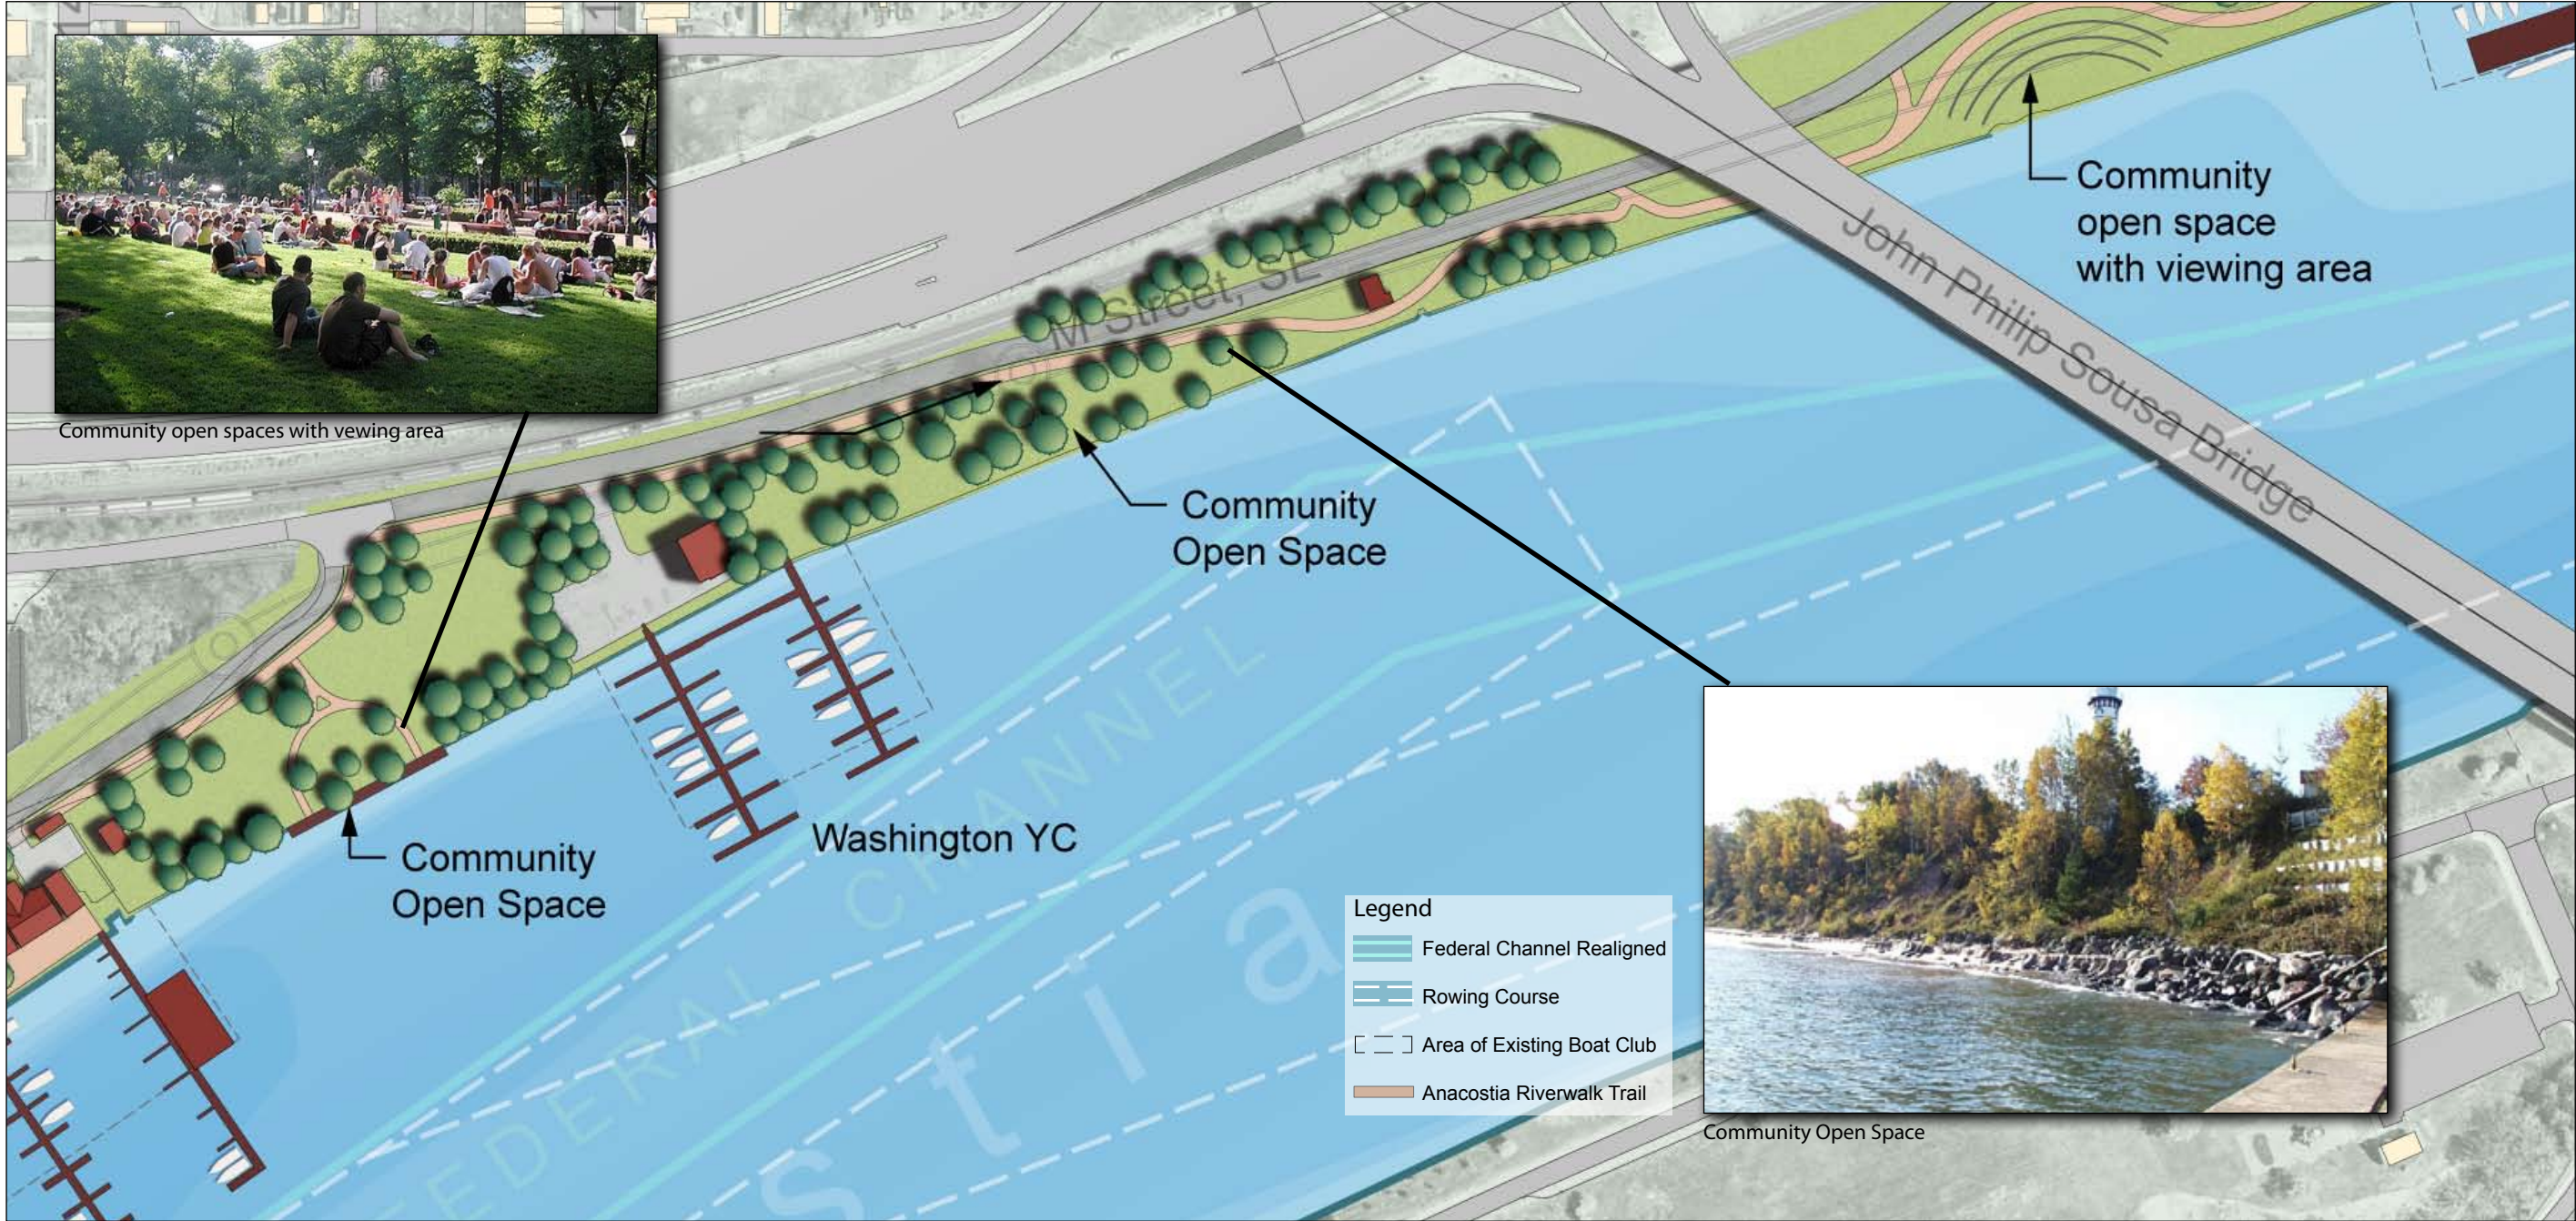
Enlarged plan of Concept 2 - Middle section
